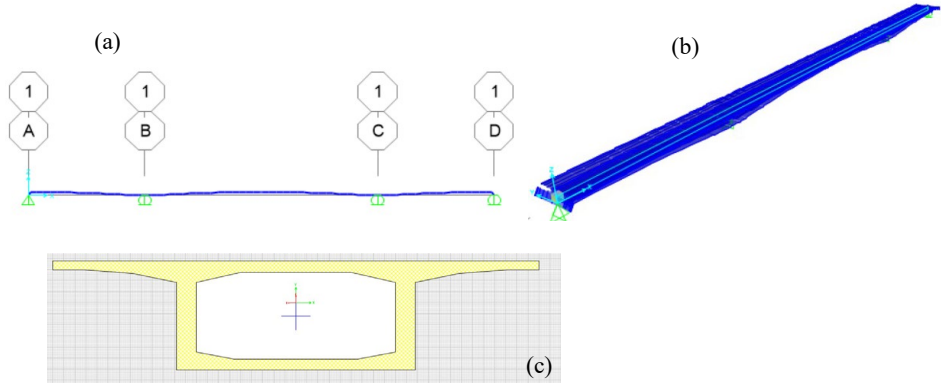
Model of the continuous girder (a), extruded overview (b), typical cross section (c).
